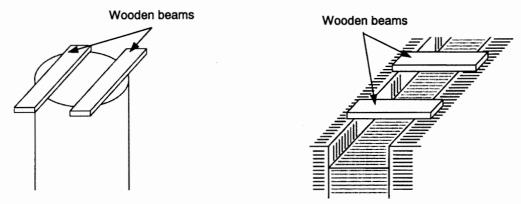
Wooden beams on a Casing Pipe Figure 4.3 Wooden beams on a Guide Wall
